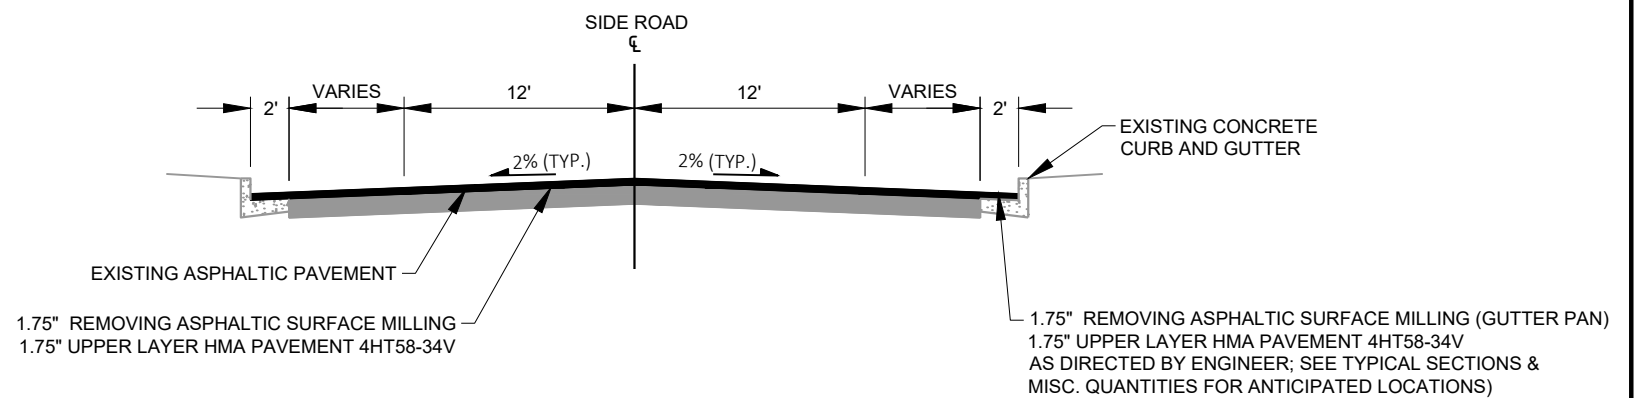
DETAIL OF PAVED SIDE ROAD - URBAN (NO MAINLINE GRADE RAISE)
